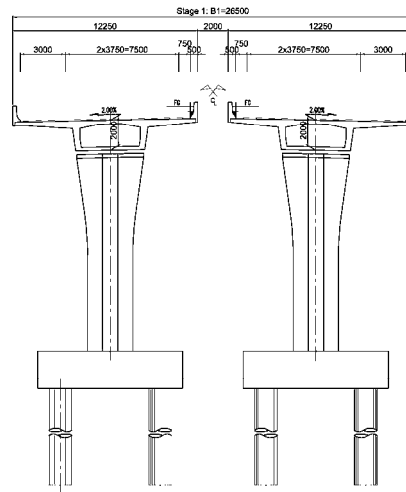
Medium Span Bridge (PC Box Girder L=50 - 90 m) Phase 1.
